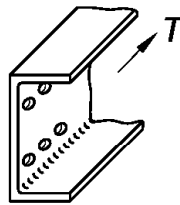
Misc. Connection: Truss Column C2 / Truss B7
